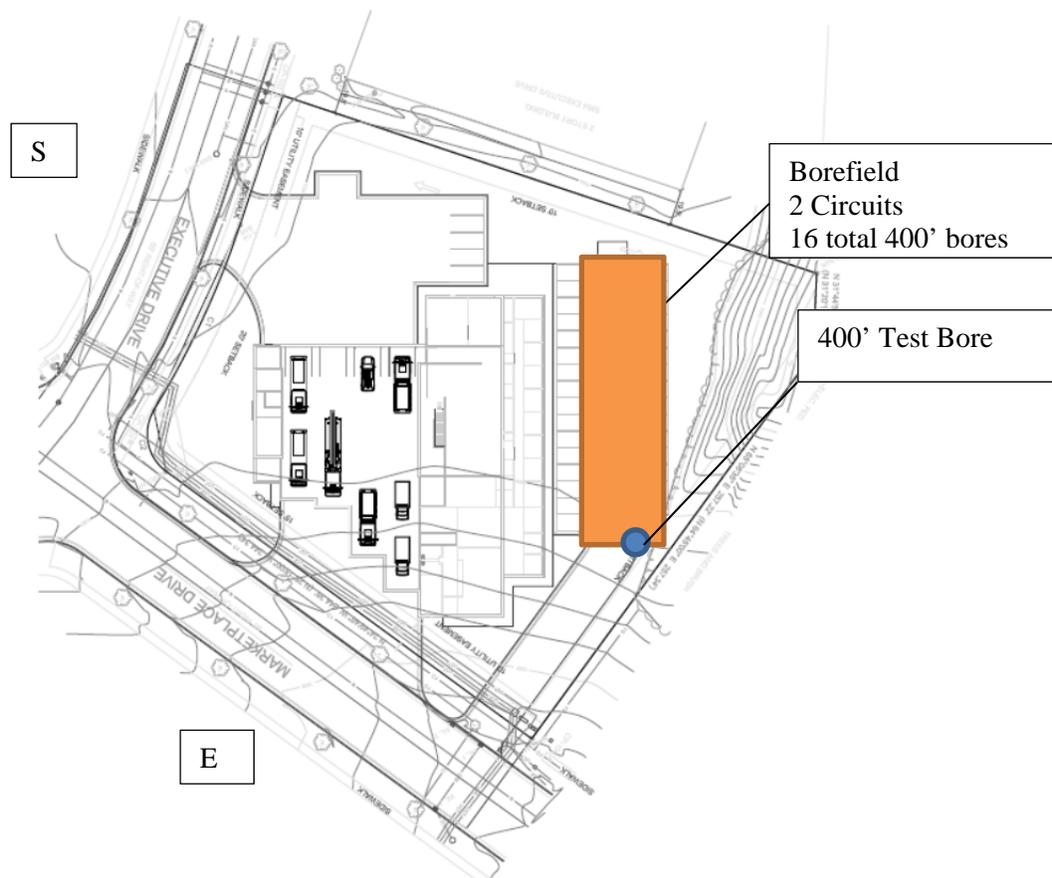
Site plan showing test bore location and proposed geothermal borefield relative to building.
